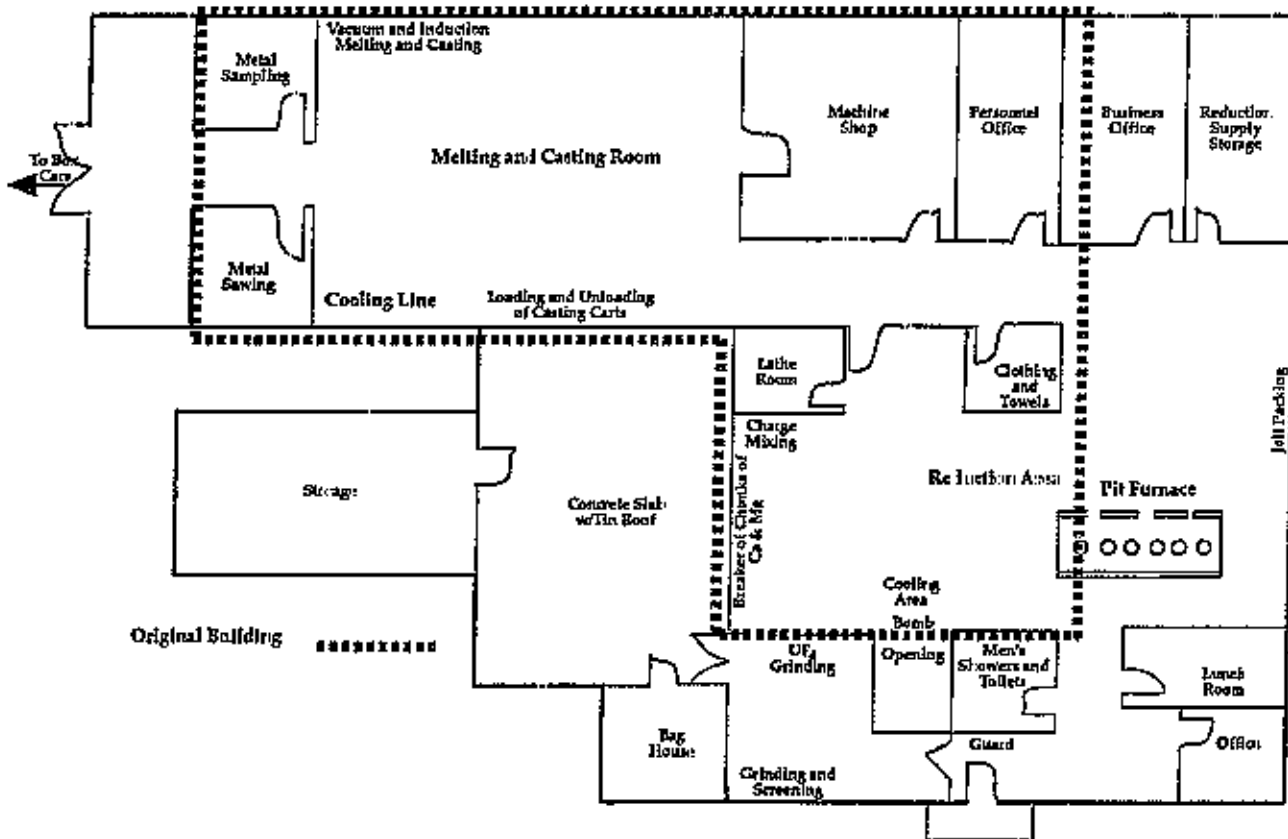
Floor plan of Little Ankeny production facility for uranium and thorium.
